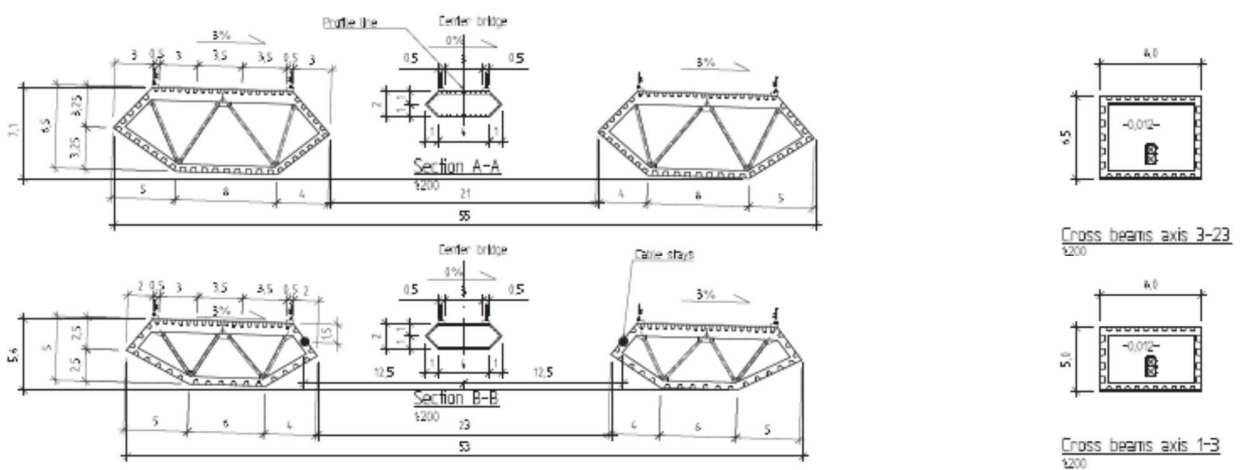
Phase 2 cross-section of bridge girder and cross beams
